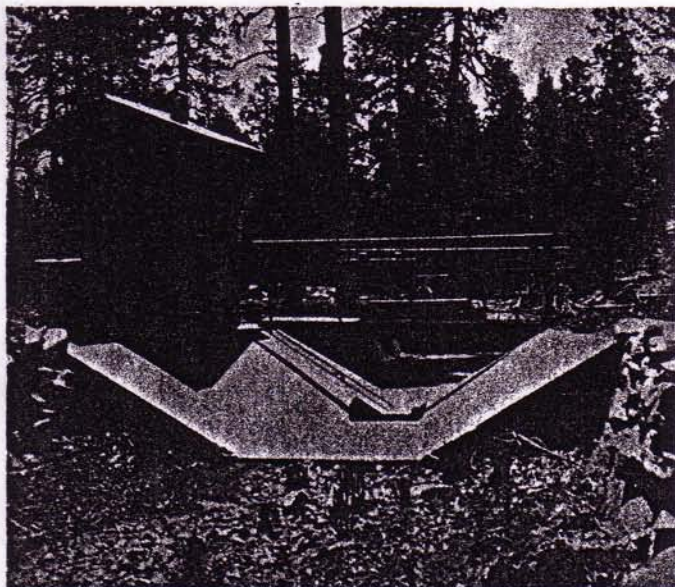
Concrete trapezoidal flume of the type used on Watersheds 1-18 on Beaver Creek.
